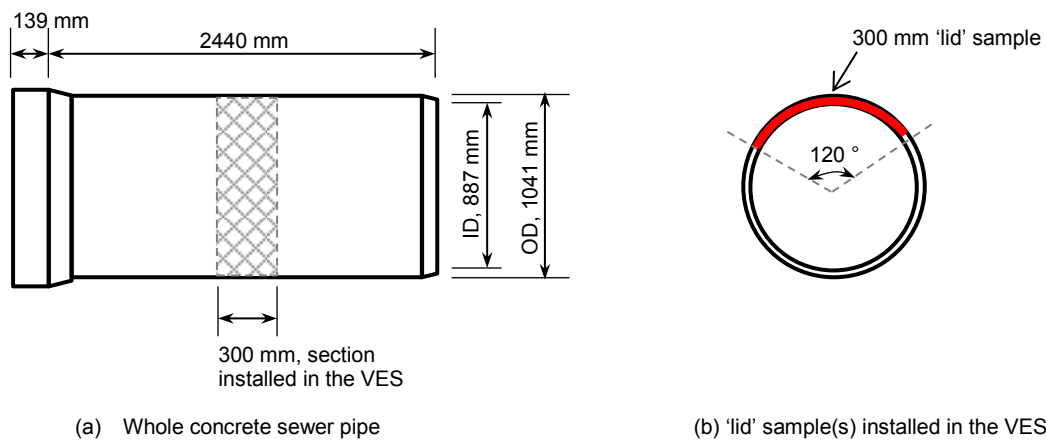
Schematic of how concrete sewer pipe samples were cut from whole pipe sections.
